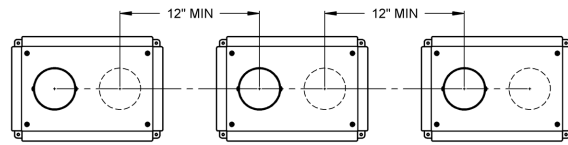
(#) Pipes extend completely through the wall (Vertical orientation shown)
